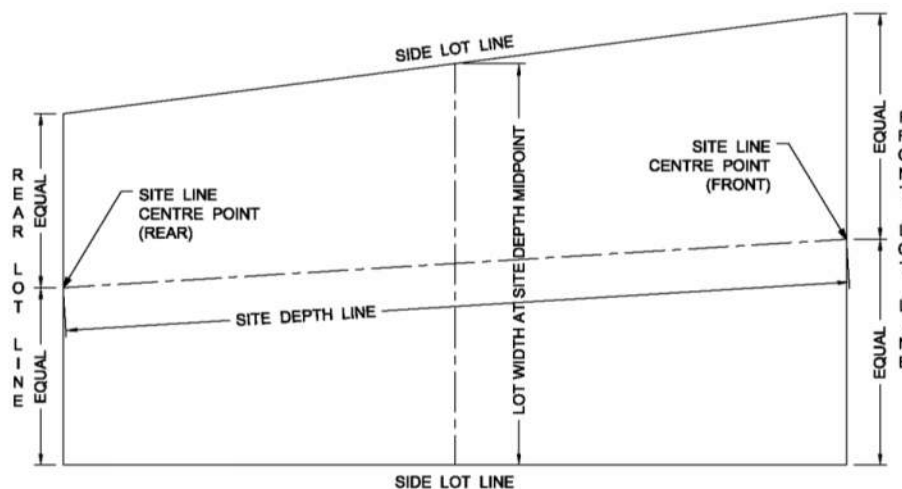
Site Characteristics: Depth, Site Depth Line, Site Line Centre Point, Site Coverage, Site Frontage
